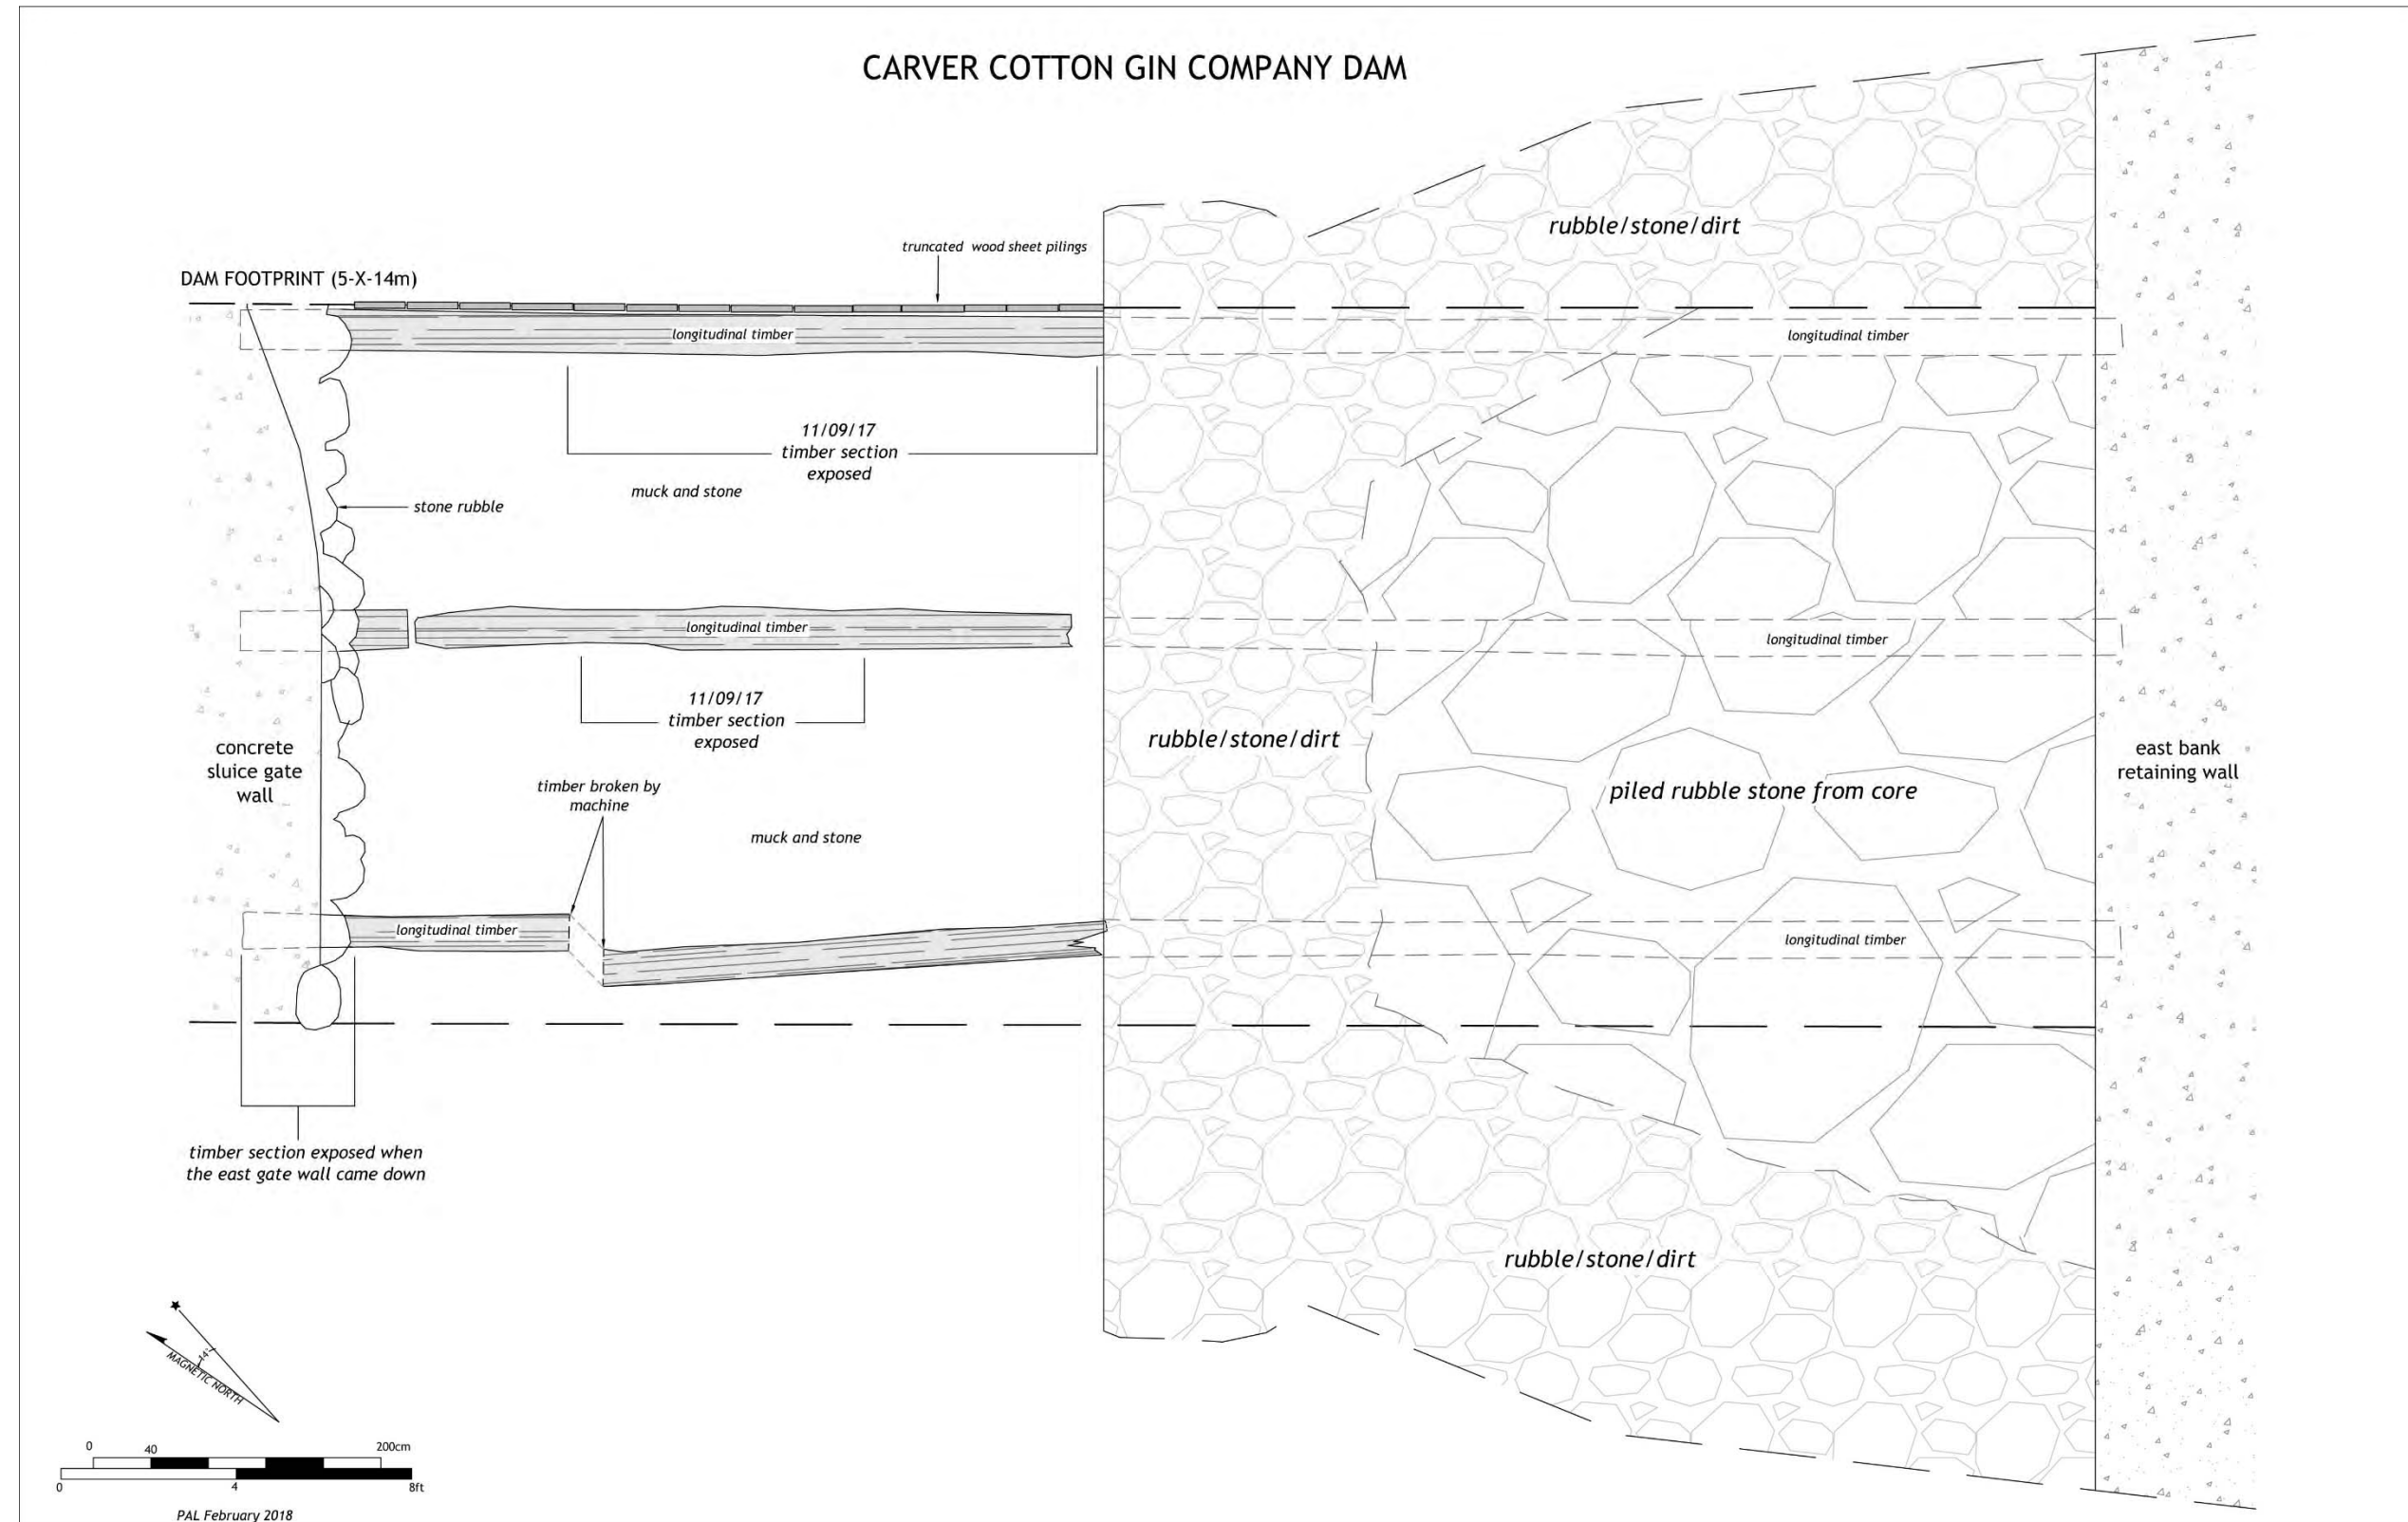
Plan drawing of longitudinal timbers exposed at base of dam.
